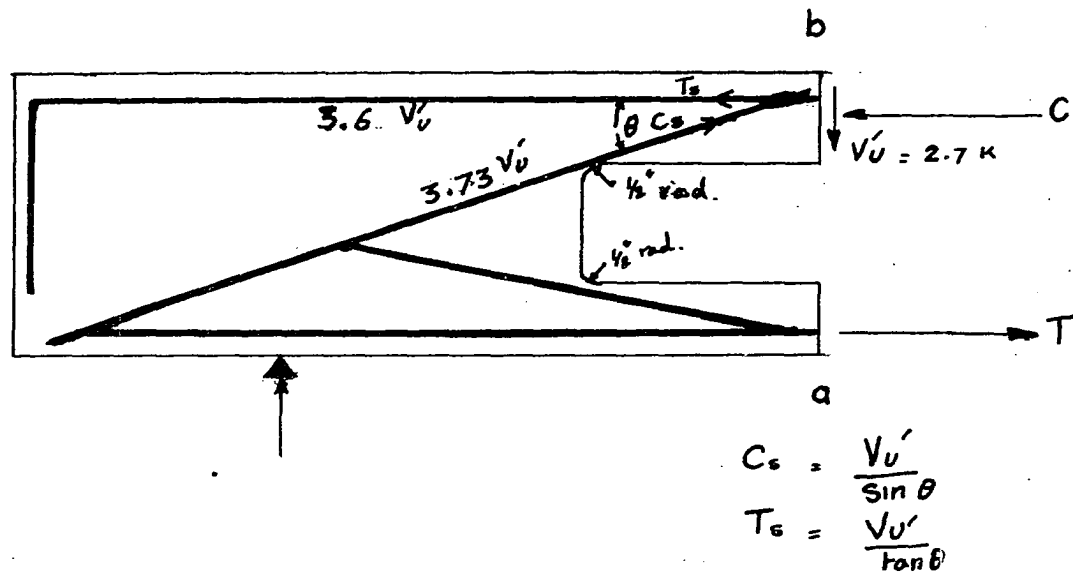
The Special Web Reinforcement Resisted the Stresses in a Manner Similar to Truss Action.
